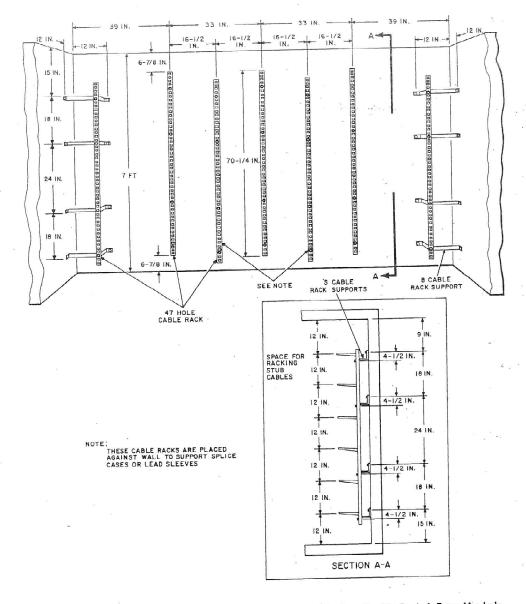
Location of Cable Racks and Hooks in Typical Double Bay, Double Rack A-Type Manhole
